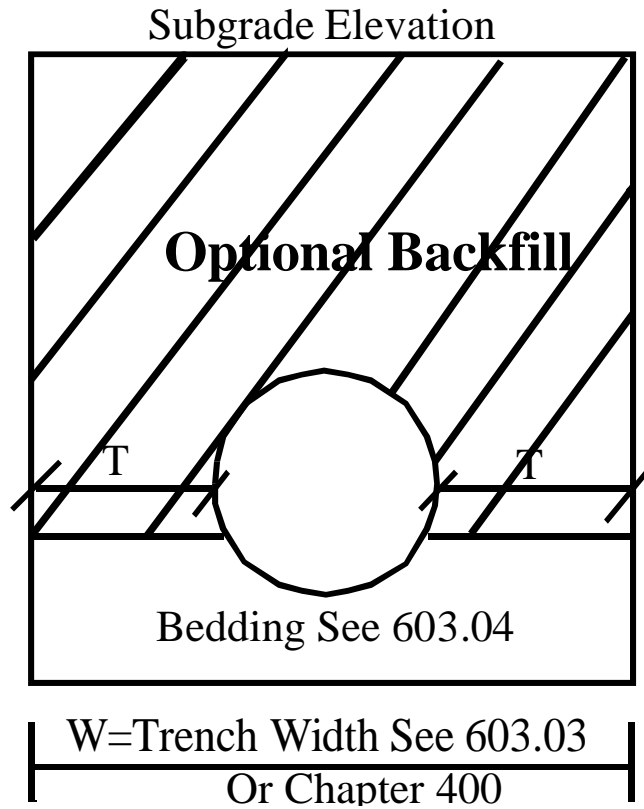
Backfill for Type C Conduits in a Cut or Fill
